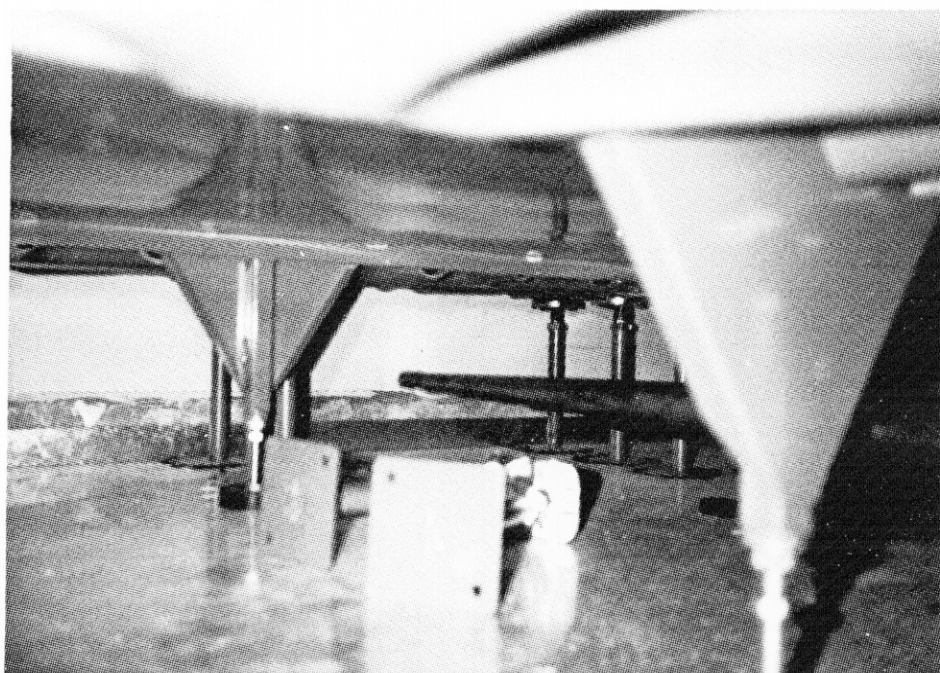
Raised Floor System (Figure 6.1 of Reference 121)
